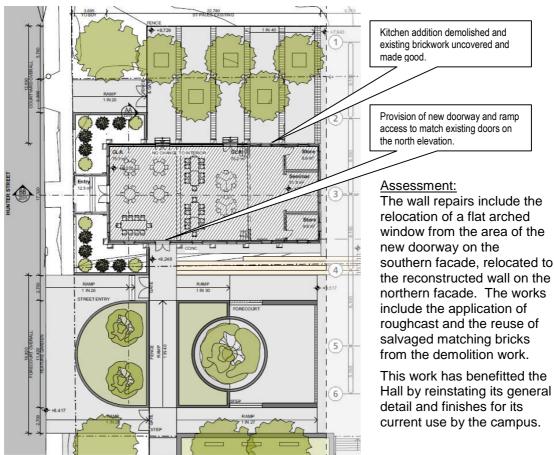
Plan of the Parish Hall adaptive reuse showing the existing Kitchen addition removed and the landscaping works. (SHAC Sheet 2002)
